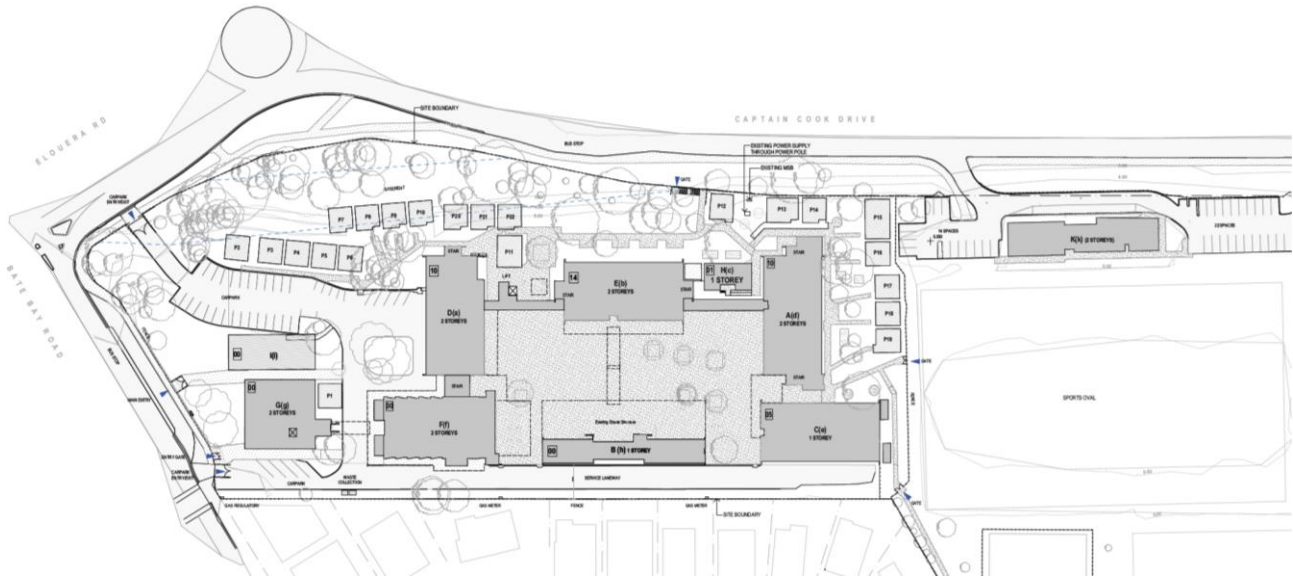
Existing layout of Cronulla High School (Source: Fulton Trotter Architects)
